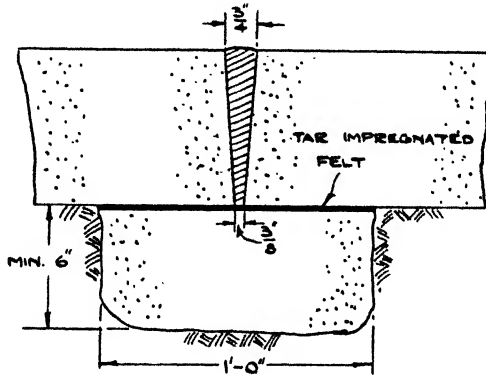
SINGLE-COURSE FLOOR JOINT IN TANK OR RESERVOIR CONSTRUCTION
